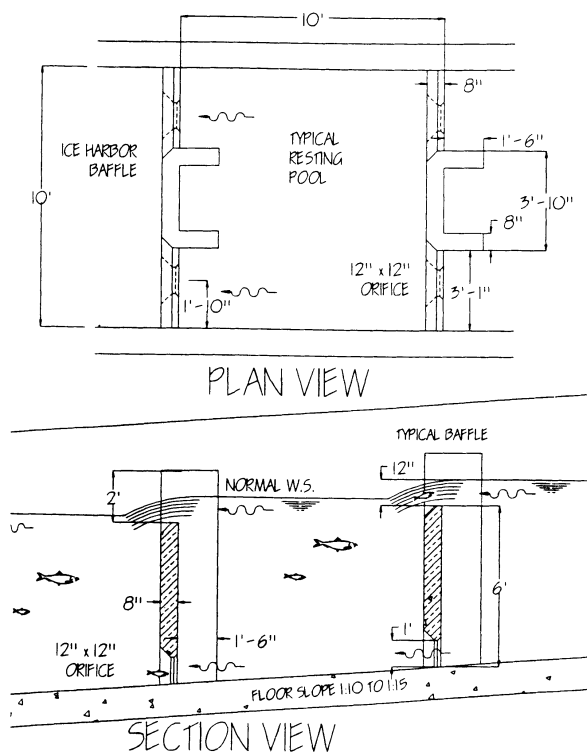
Plan and section views of a typical pool and weir fishway.
